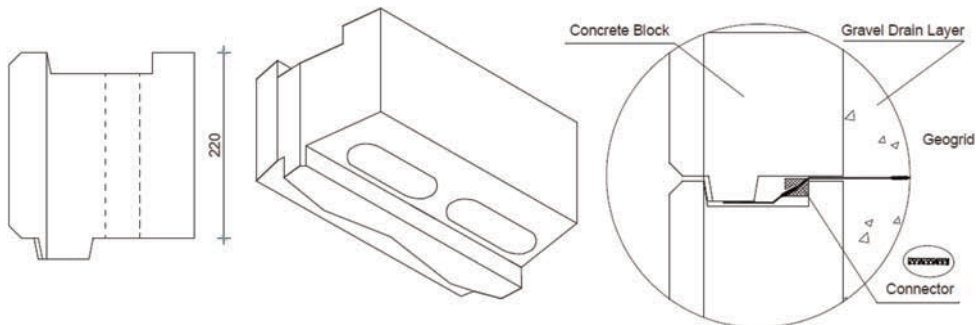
The concrete blocks: a) Cross section; b) 3-D view; c) Detail of geogrid–block connection.
